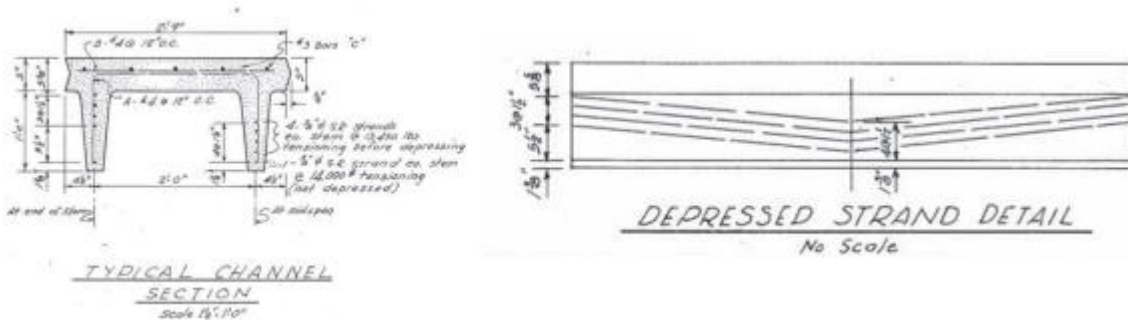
Typical cross-section of skinny-leg channel girder (SCDOT drawing)
